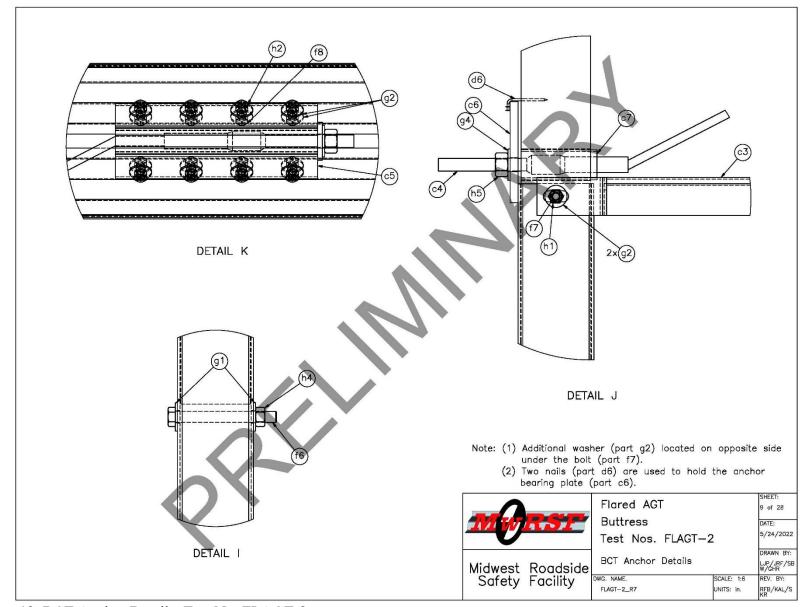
BCT Anchor Details, Test No. FLAGT-2
